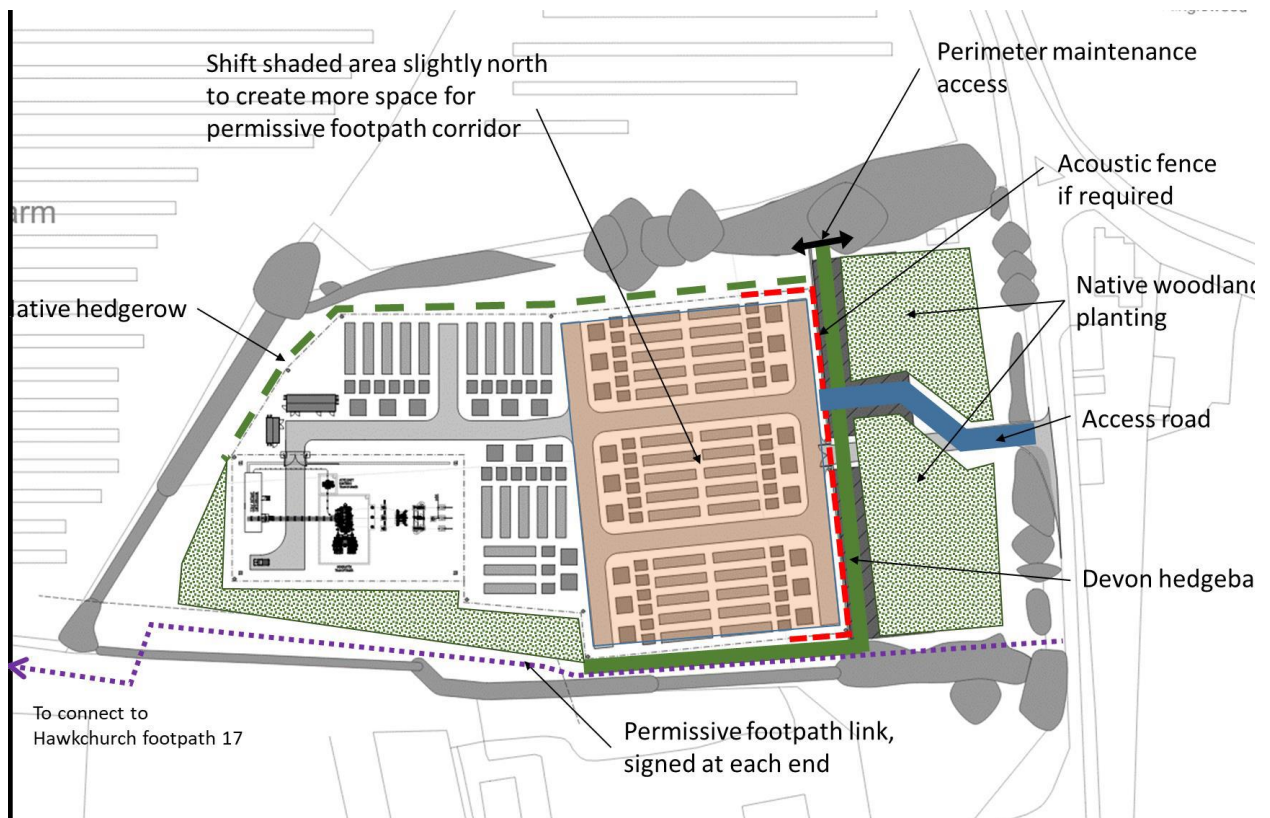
Indicative amendments to proposed site layout to reduce landscape impact
